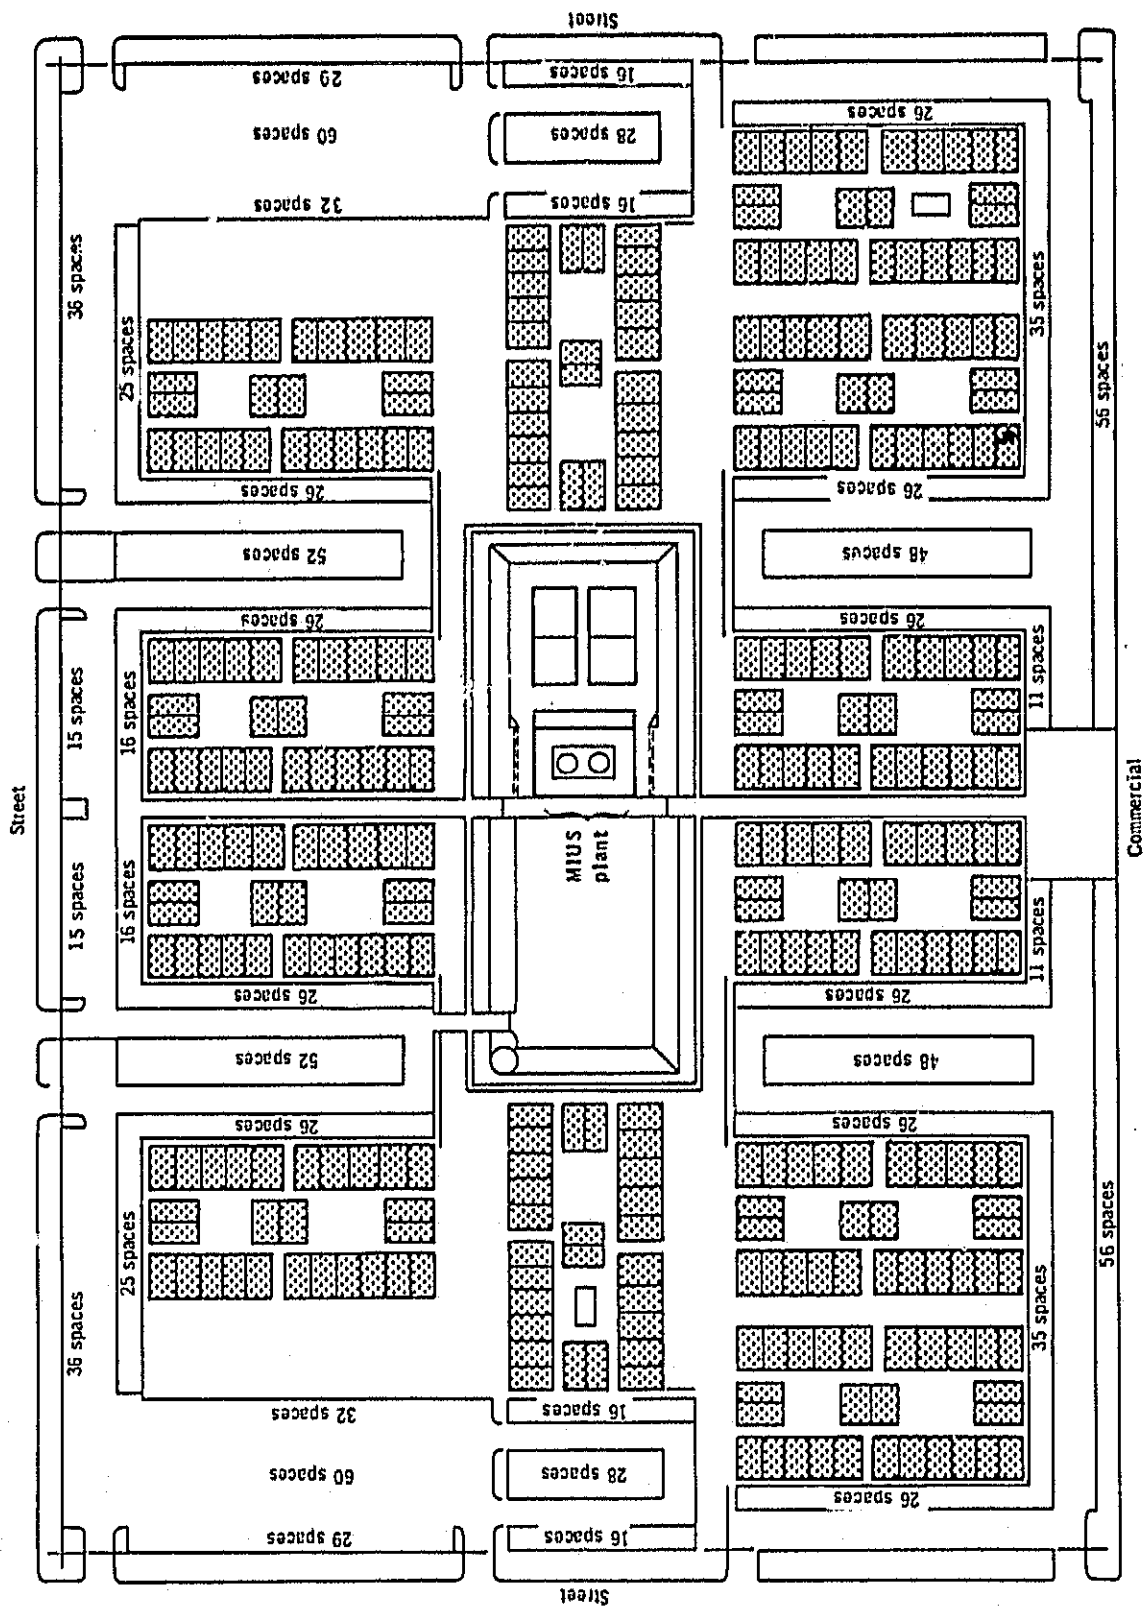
The 648-unit garden apartment complex site plan, typical of apartment layouts in the Houston area.
